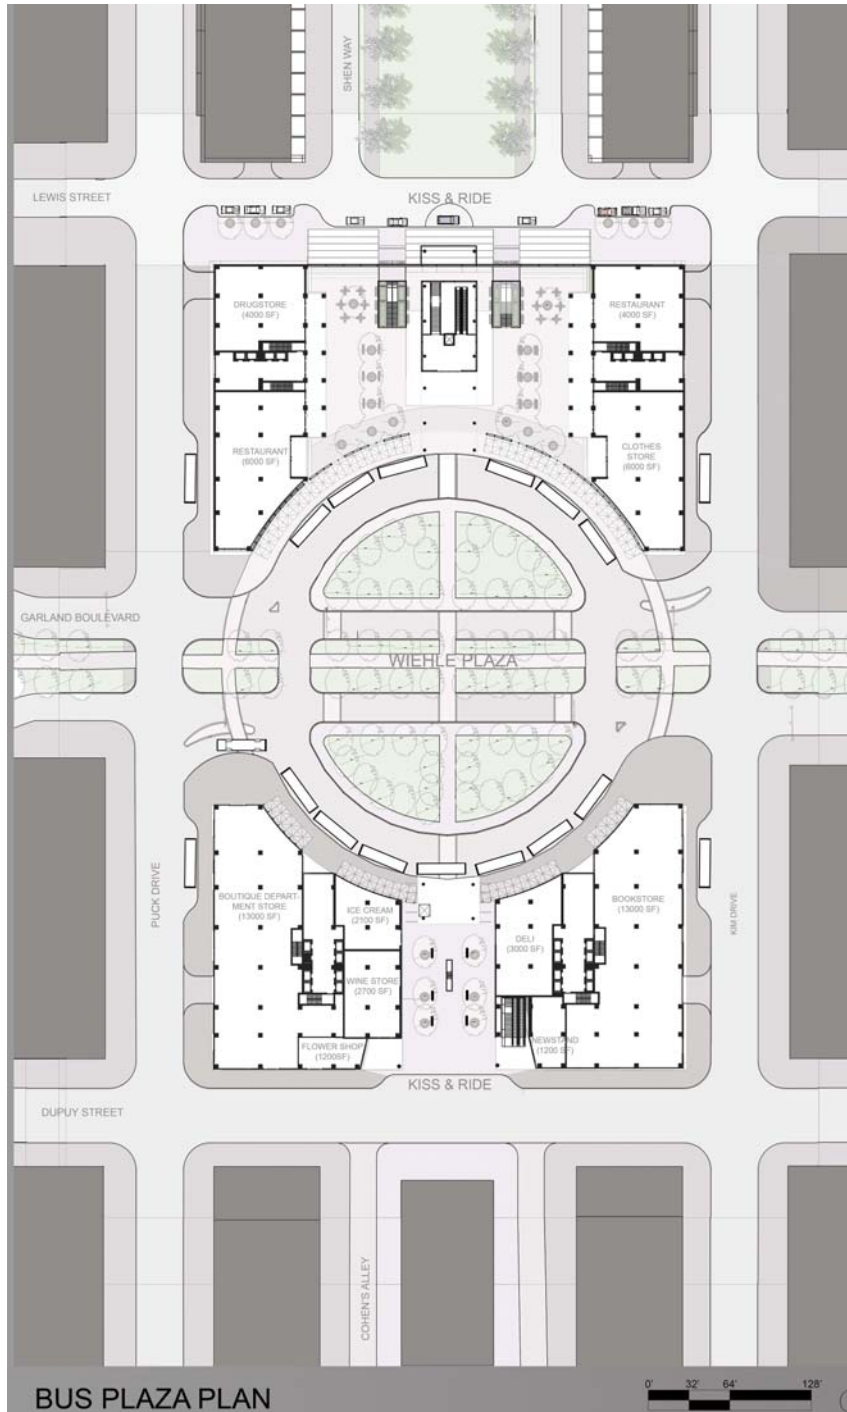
Upper Plaza Level Plan of Transit Plaza
